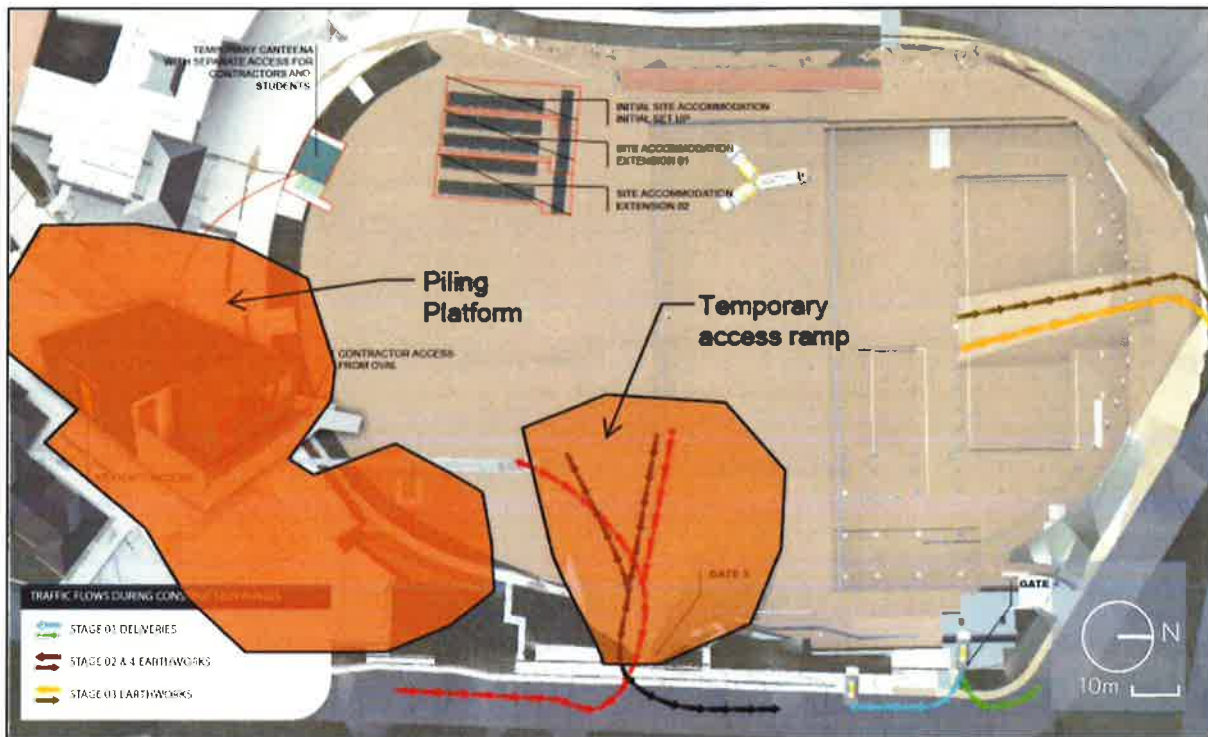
| Site plan during excavation and shoring works (Source: Applicant's RtS 2019).
